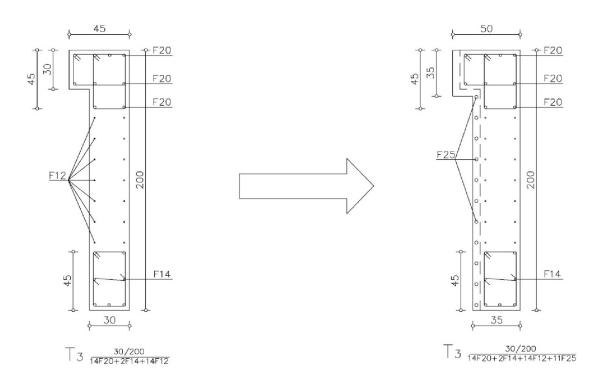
T3 Column Cross Section Area-Before and After one sided strengthening
